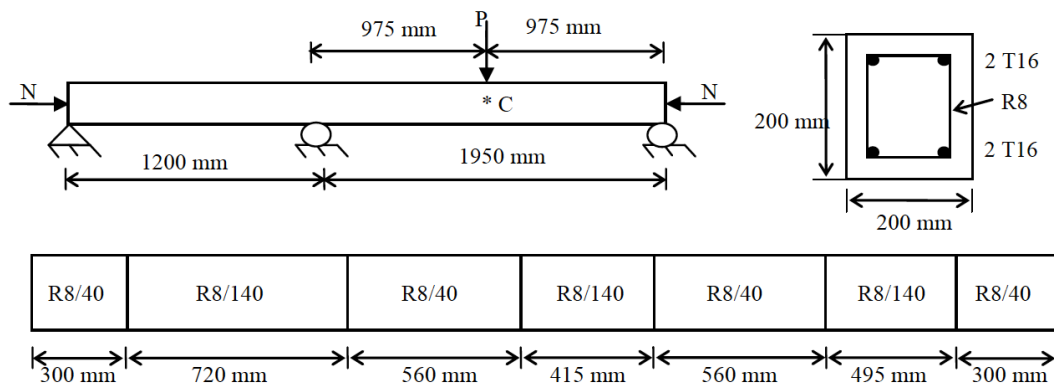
Dimensions, loading arrangement and reinforcement detailing of the column (adapted from Kotsovos et al, 2007)
